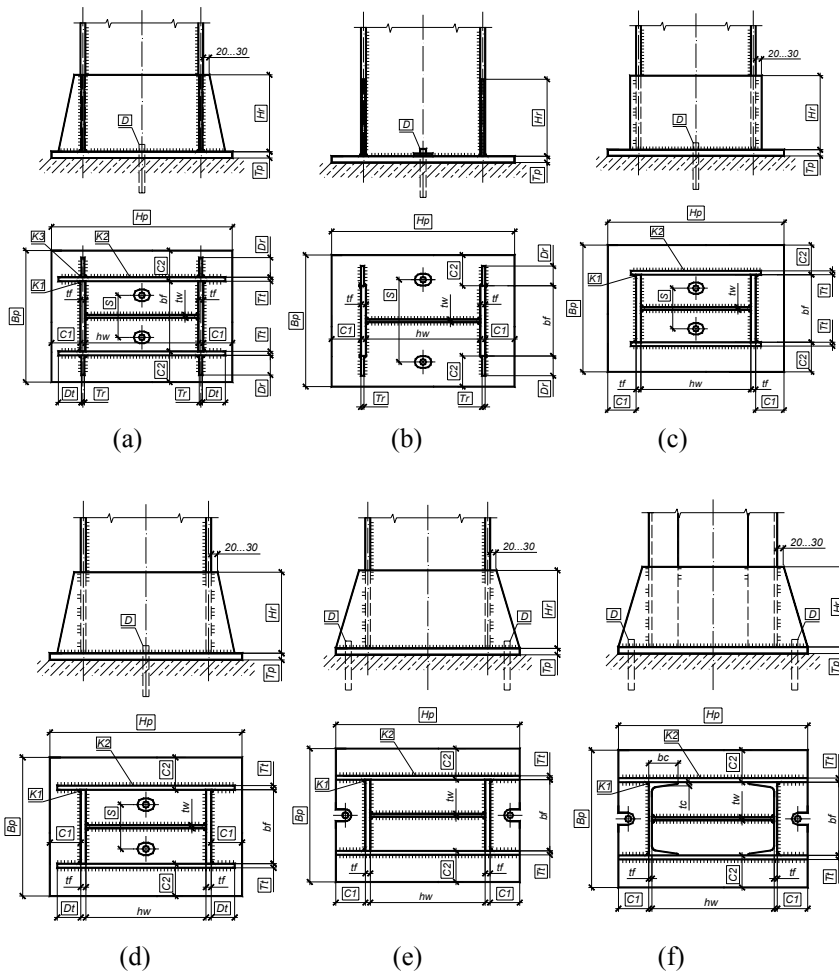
Structural schemes for pinned column bases with wing plates and stiffening ribs
